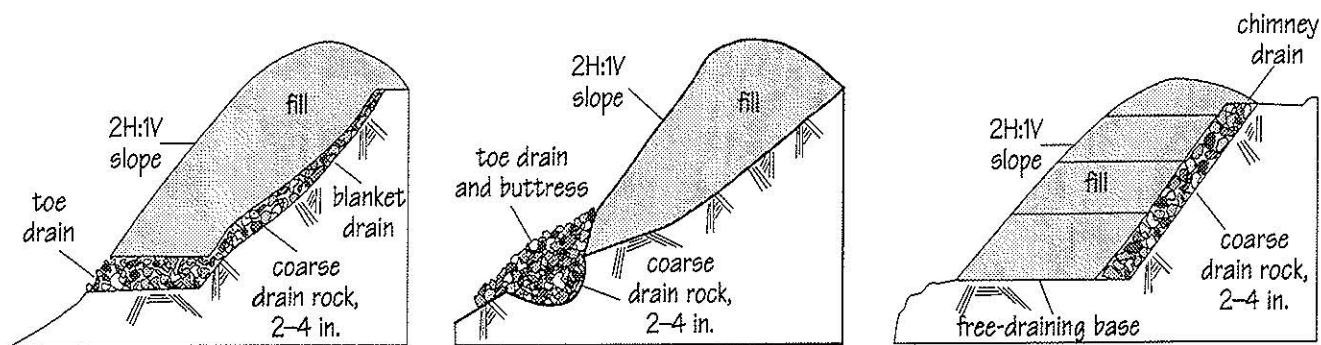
Details of toe, blanket, and chimney drain construction shown in cross section. (See also p. 2.19.)
